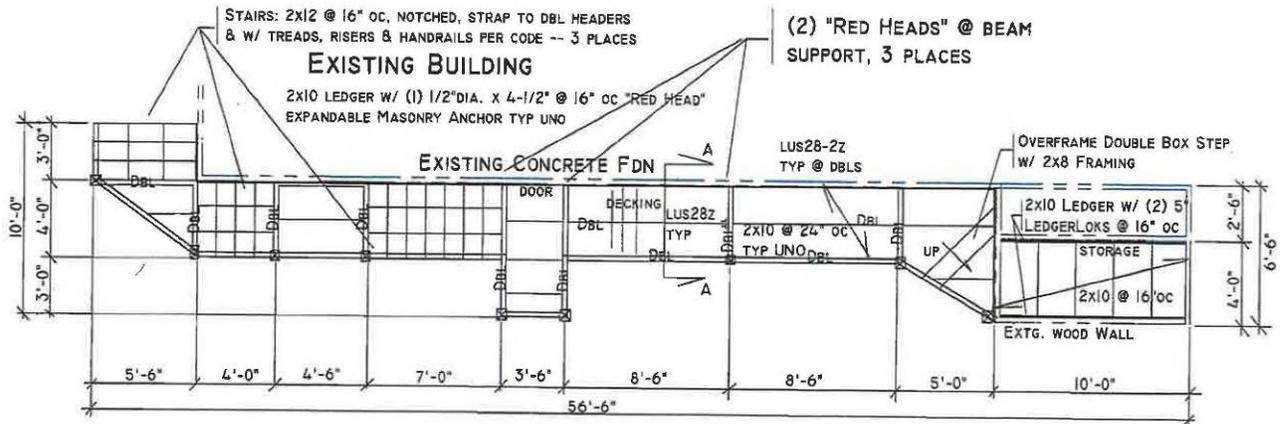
Location of deck and stairs replacement: Rear façade of building facing Church Street.
